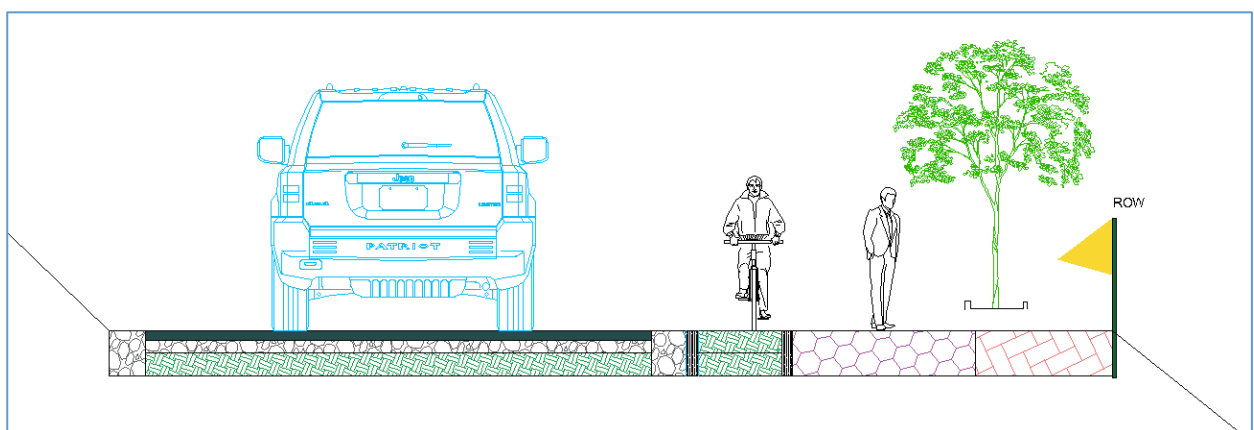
Typical Cross Section of Arterial Road (Class B)
